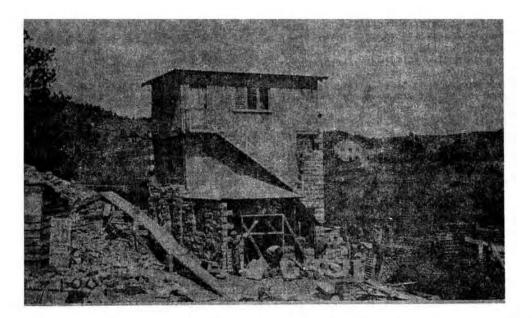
Construction of the Elevator Building at Wind Cave National Park by the Civilian Conservation Corps, 1938. The Park Visitor Center and Headquarters is visible in the background and to the right of the Elevator Building. (Photo courtesy National Park Service) the trail in first class condition. The trail had been surfaced with screened gravel which made walking easier and cut the tour from 1/2 hours down to 1 hour.
